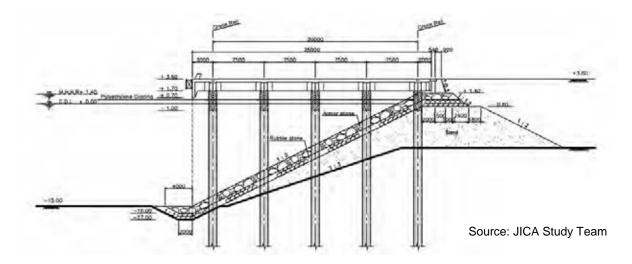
Typical Cross Section of the Wharf at Tg. Bulupandan
